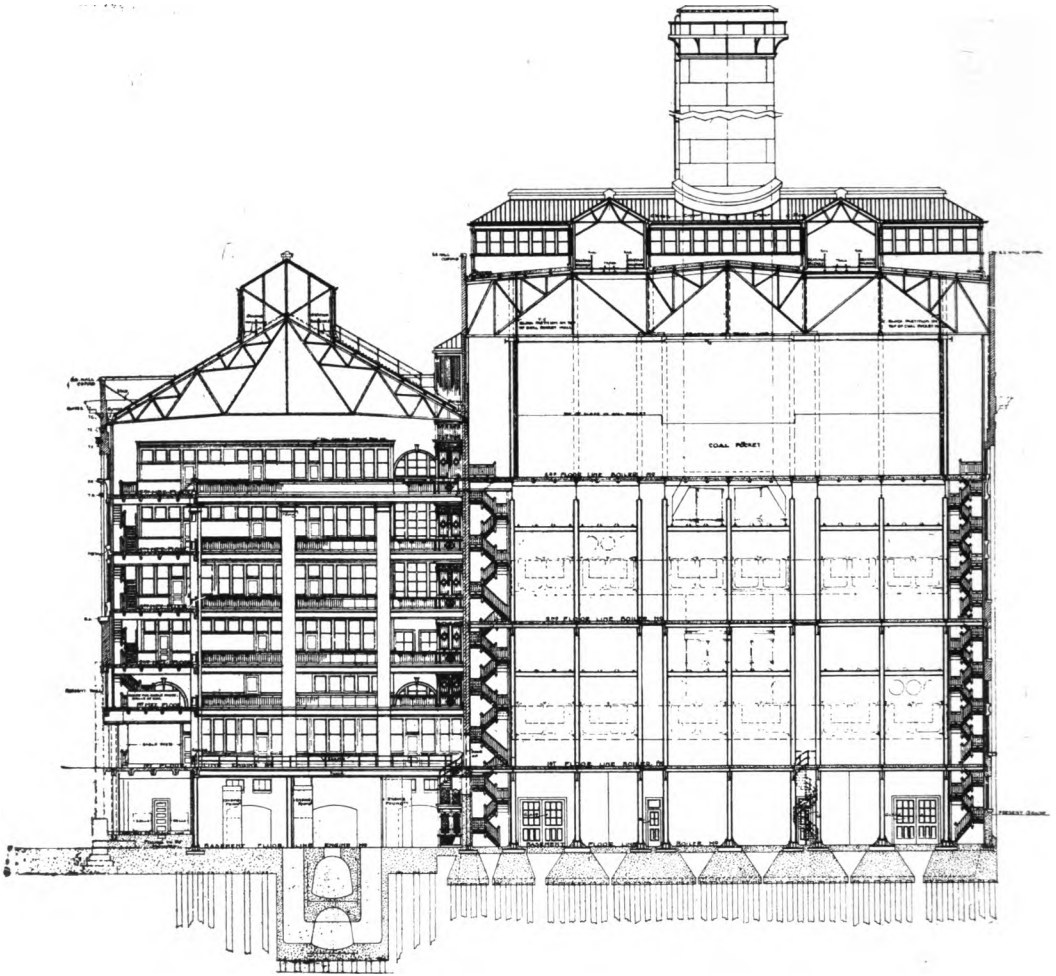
Cross Section on Line A-B, Williamsburg Station.
